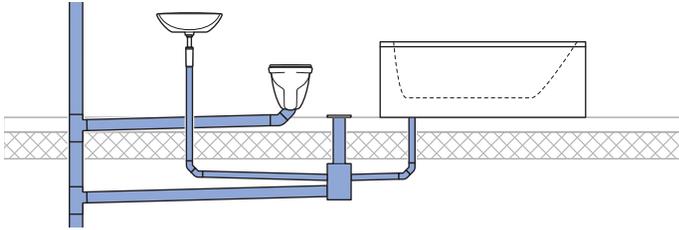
Laying the branch discharge pipe under and above the ceiling, single stack
